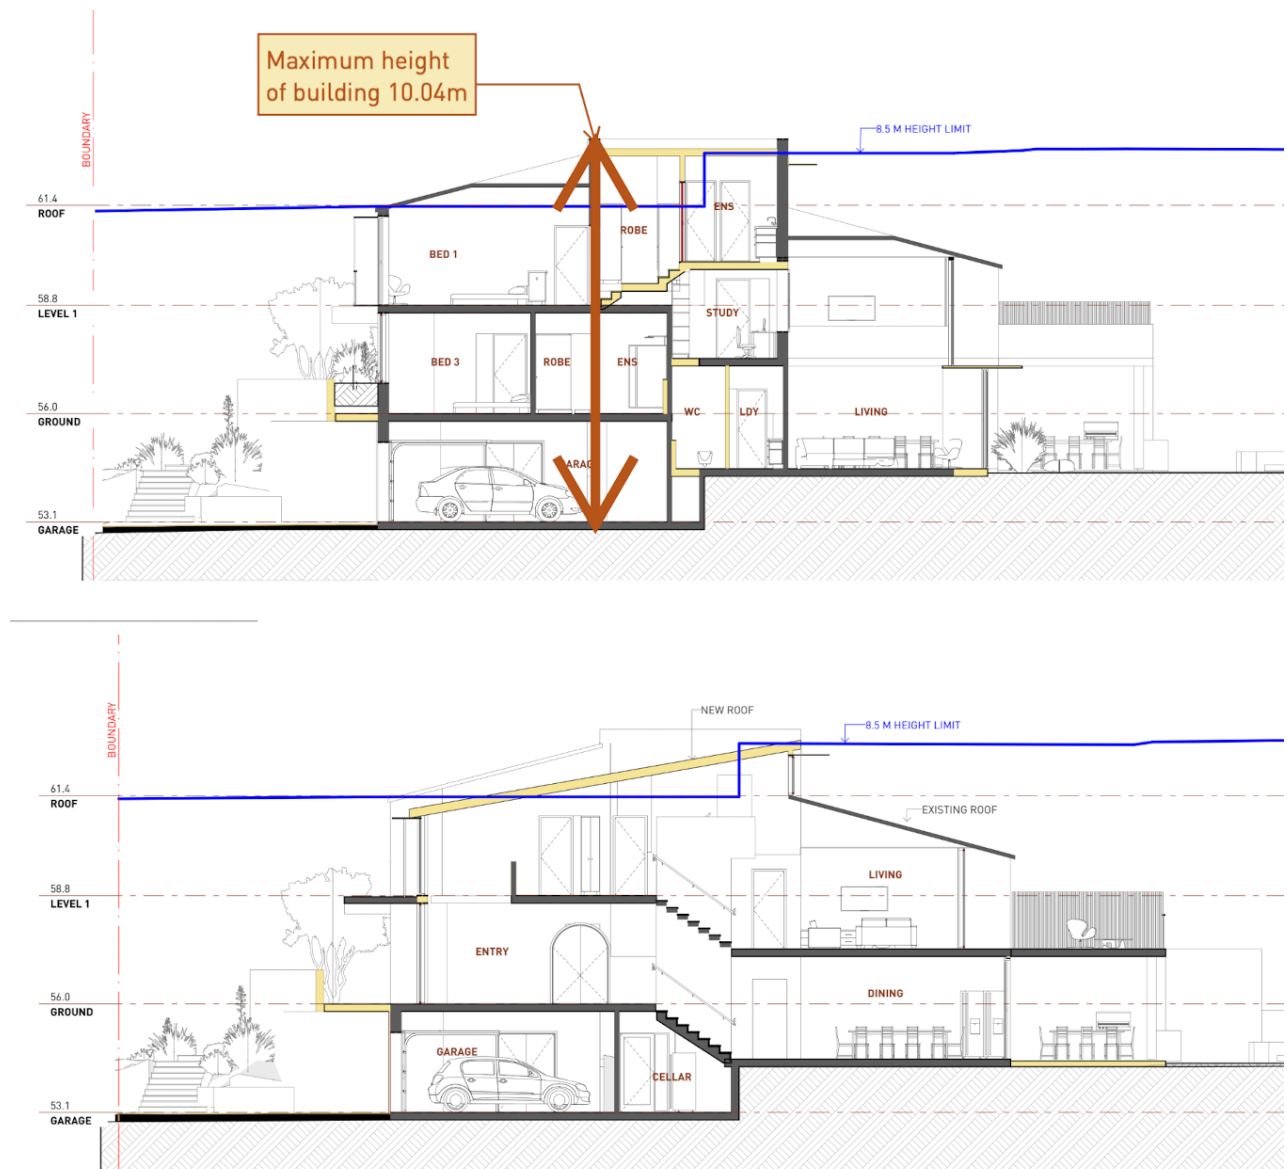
SECTION THROUGH DWELLING SHOWING PARTS OF THE BUILDING ABOVE THE 8.5M HEIGHT LIMIT – POINT OF MAXIMUM HEIGHT INDICATED ON SECTION.
